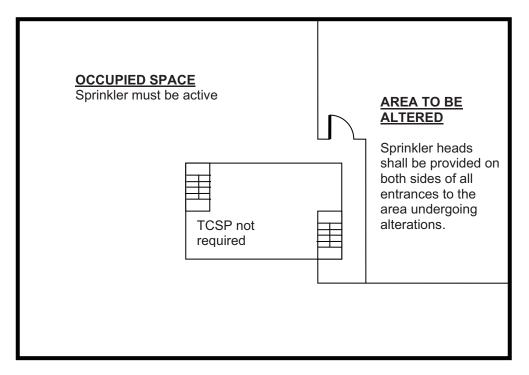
ALTERATION ON PART OF AN EXISTING, FULLY SPRINKLERED FLOOR
